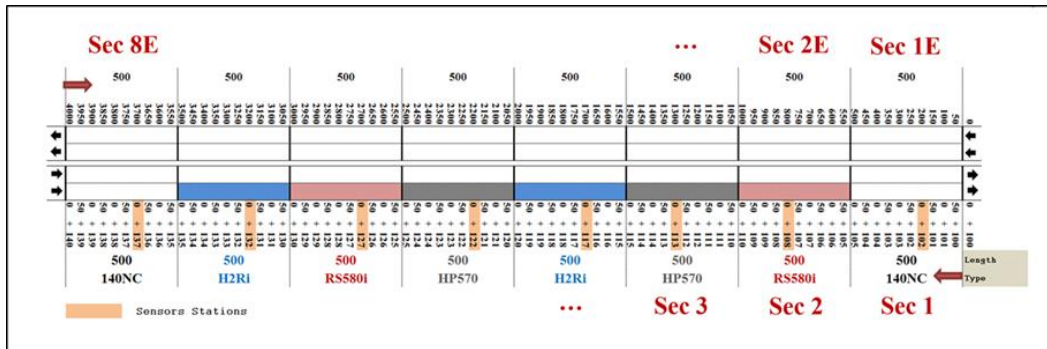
Arrangement of Test Sections on SH-21, Bastrop, Texas
